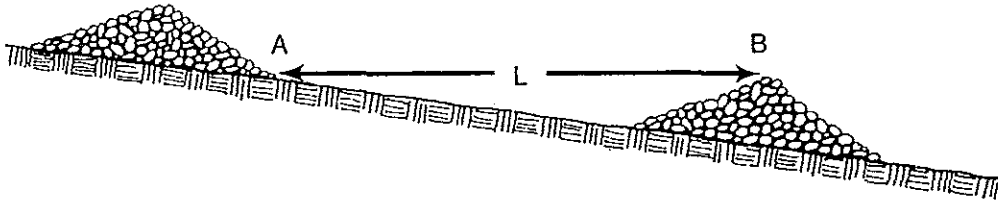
Space check dams in a channel so that the crest of downstream dam is at elevation of the toe of upstream dam.
